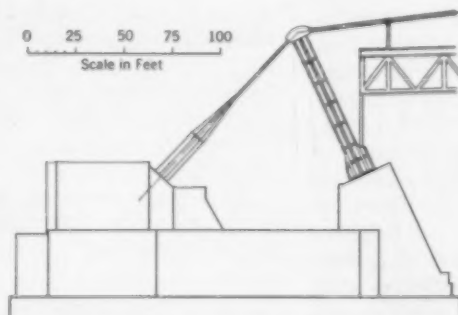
STATUS OF TRIBOROUGH BRIDGE ANCHORAGES WHEN NEW DESIGN WAS UNDERTAKEN
